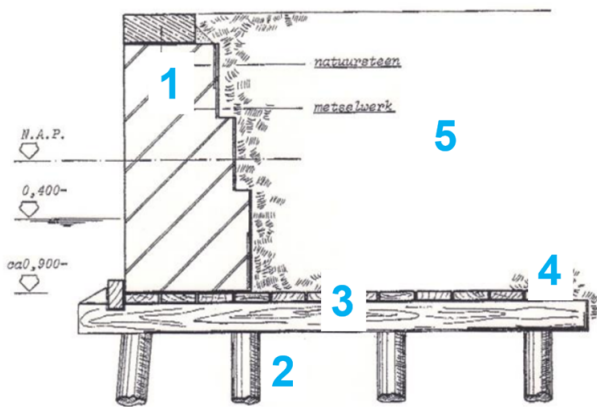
Typical quay wall in Amsterdam. (Gemeente Amsterdam, 2021c)
